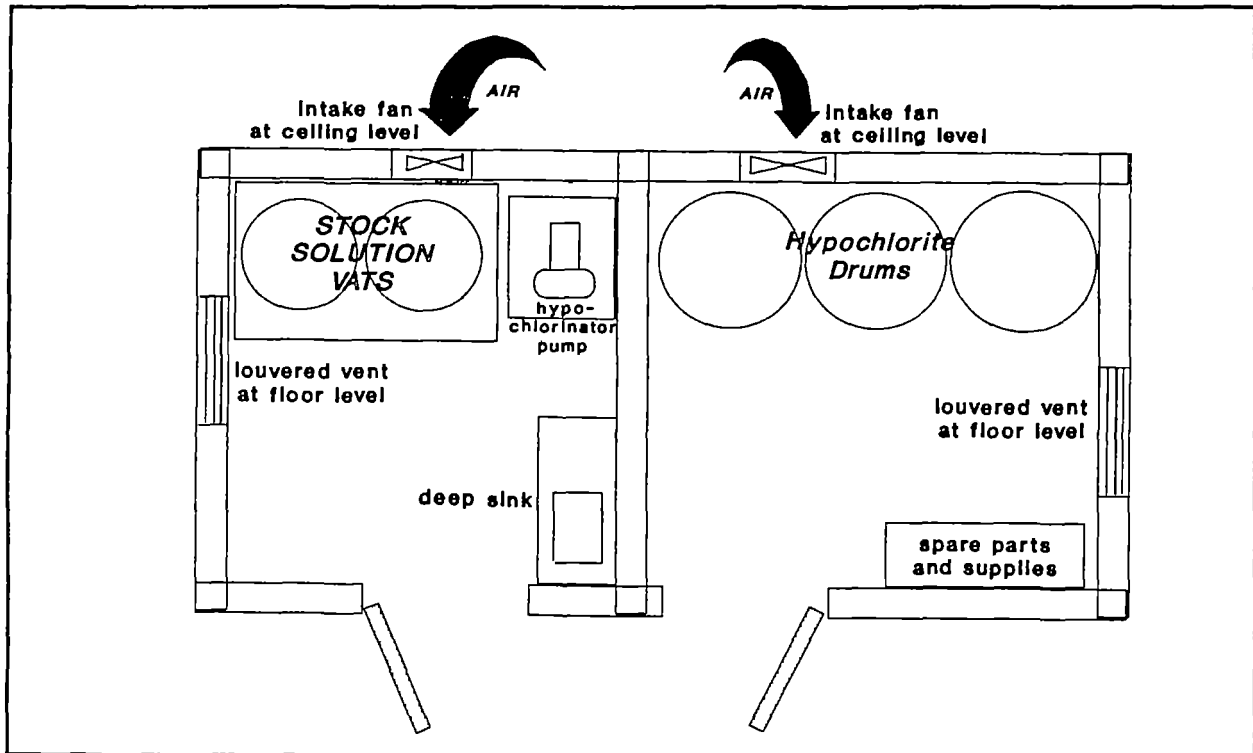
Typical plan of a hypochlorination and hypochlorite storage facility.
